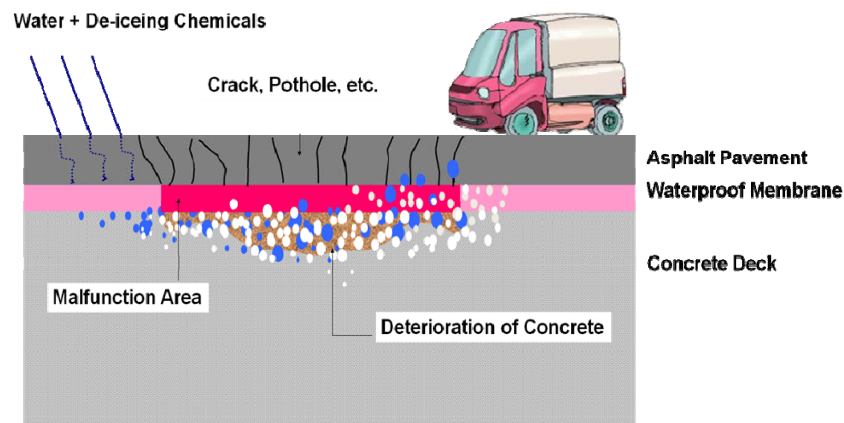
Deterioration overview of a concrete deck with an asphalt overlay
